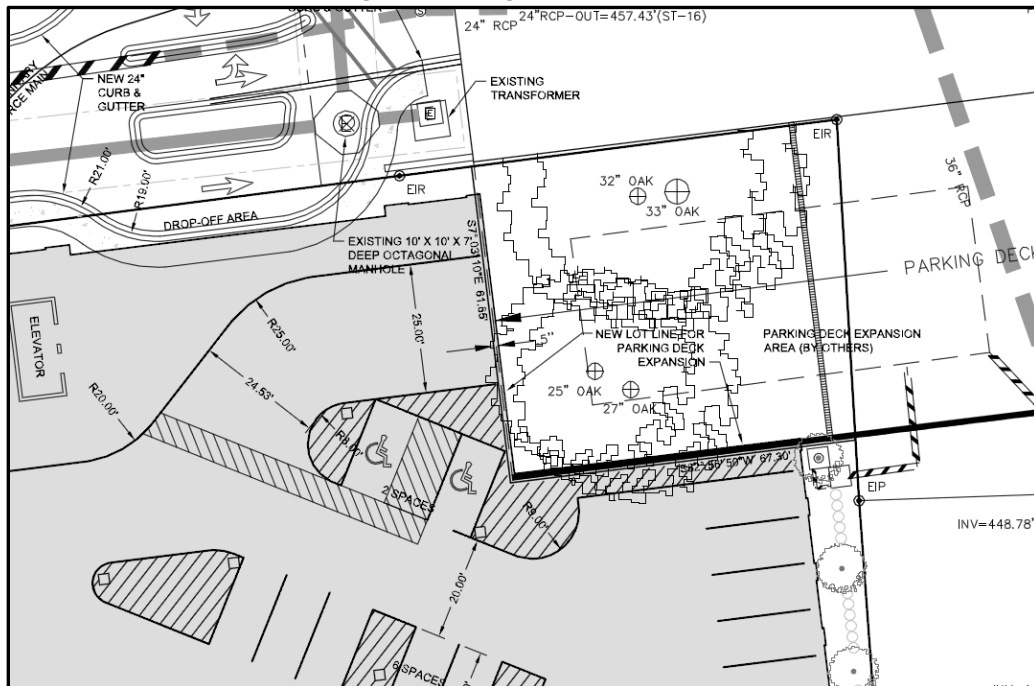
Proposed entrance to underground hotel parking from parking deck expansion
